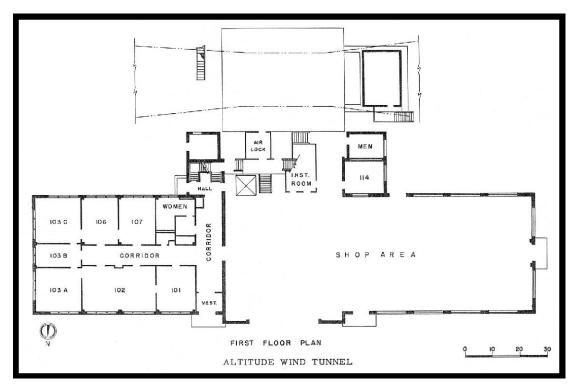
Plan of the first floor of the Shop and Office Building, 1967 (OH_Cuyahoga_AWT-Support_007).
